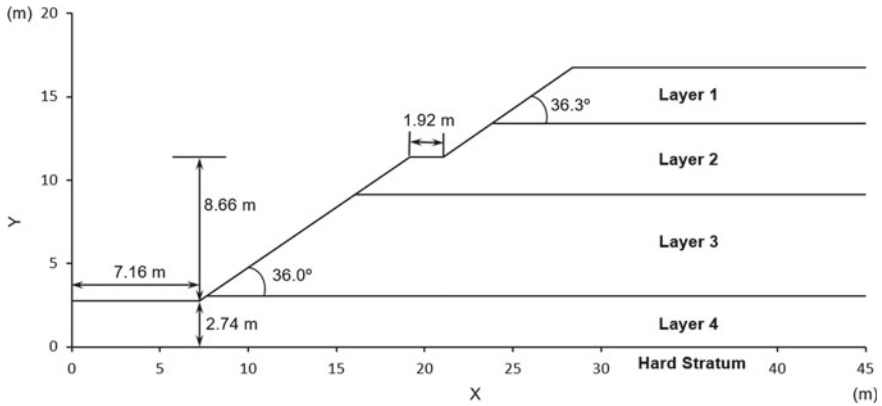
Slope section for example 1: Cross section of the Congress Street open cut (after Ji and Low [9])
